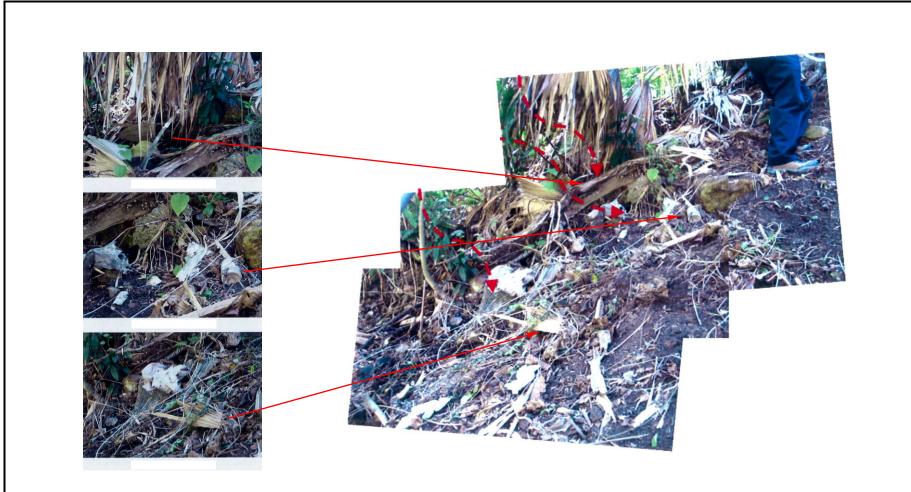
General Rubbish on Sloping Ground above Retaining Wall No. 11SW-A/R677 (Photograph taken by GEO on 1 June 2007)
